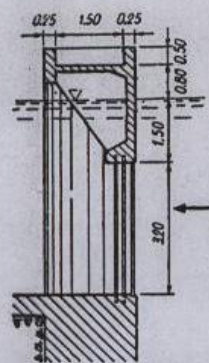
/24. Combined skimmer wall and coarse rack. Pernegg power station, Mur River, Austria
